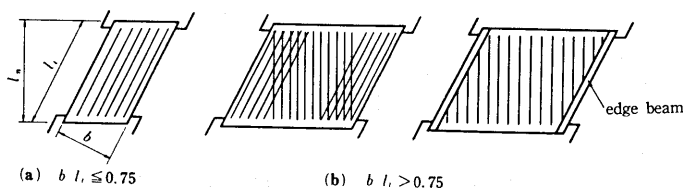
Placing of primary reinforcement for skewed slabs
